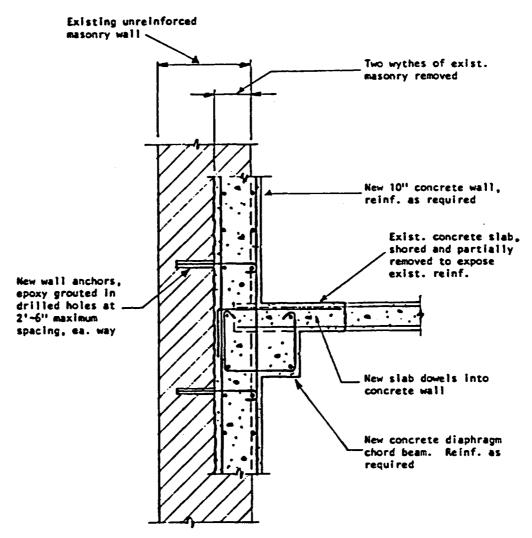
Strengthening of existing unreinforced masonry walls or piers
